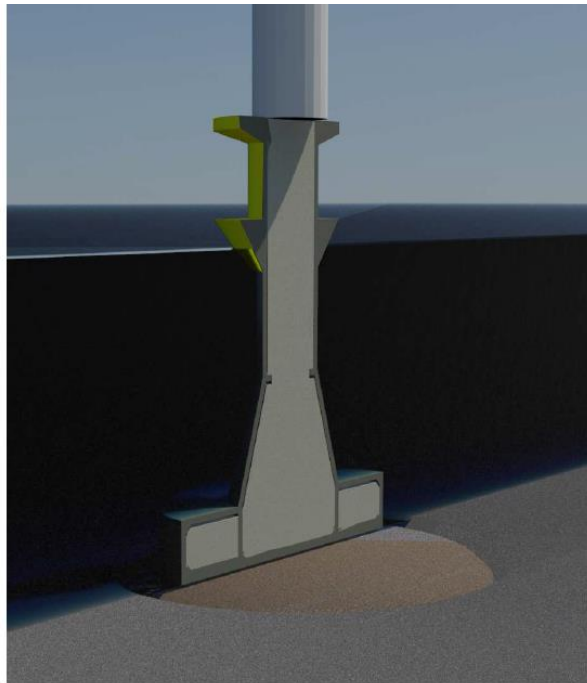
Installed Semi Floating Gravity Base Foundation
